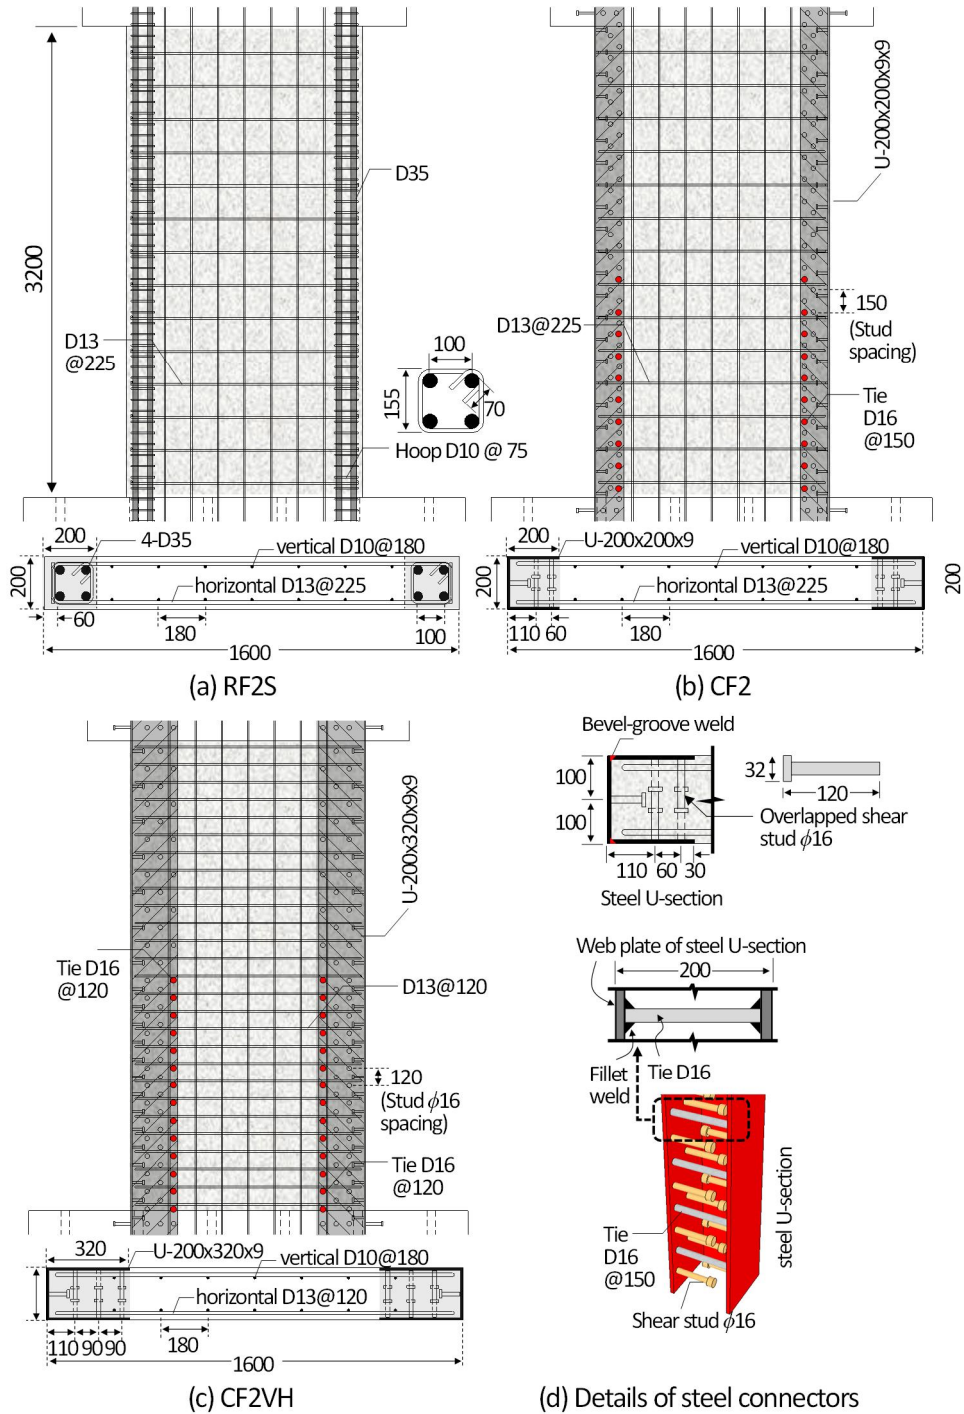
Details of flexural yielding specimens: (a) RF2; (b) CF2; (c) CF2VH; and (d) details of steel connectors.
